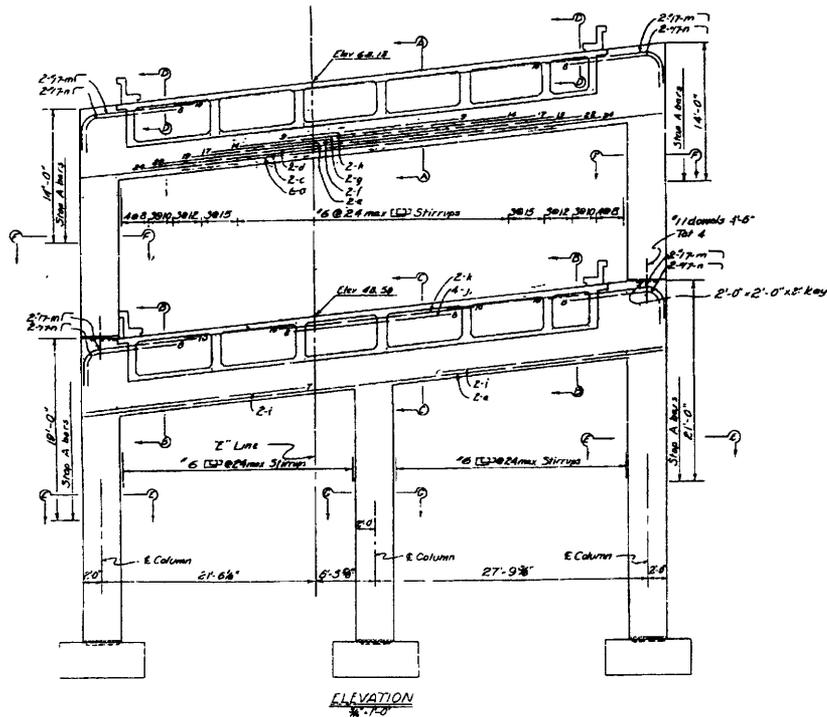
Elevation drawing of Bent 71 at Embarcadero Viaduct.
